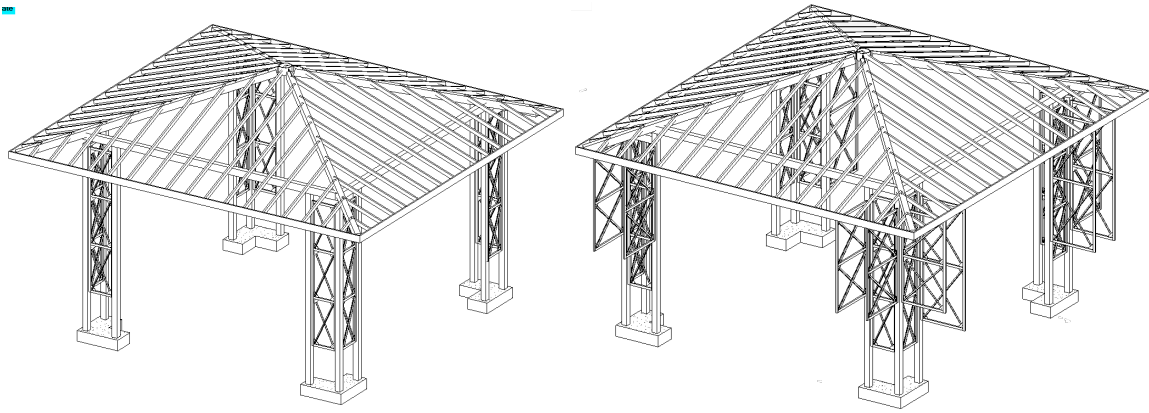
Soğukluk* roof structure exported from Revit, (a) Roof structure only, (b) Structure with side carriers
